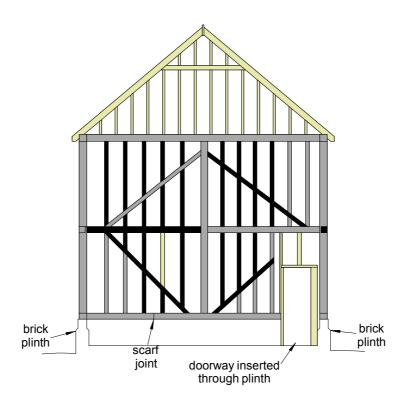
Frame drawing of north-east elevation, indicating the locations of original, re-used and replacement timbers.
